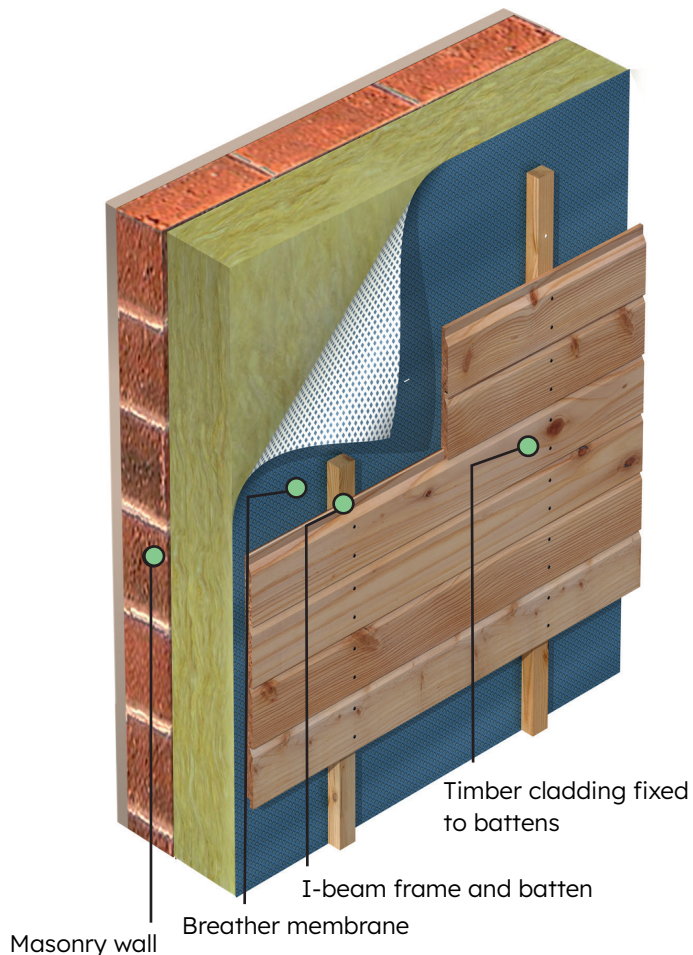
IMAGE: Method C, cladding battens over secondary I-beam frames, independent of the existing masonry wall
